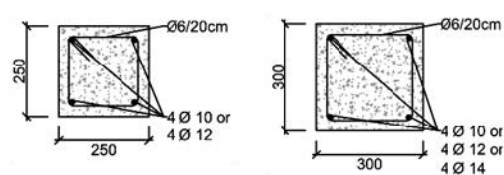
Details of RC beams and columns (some examples – 2nd floor).
